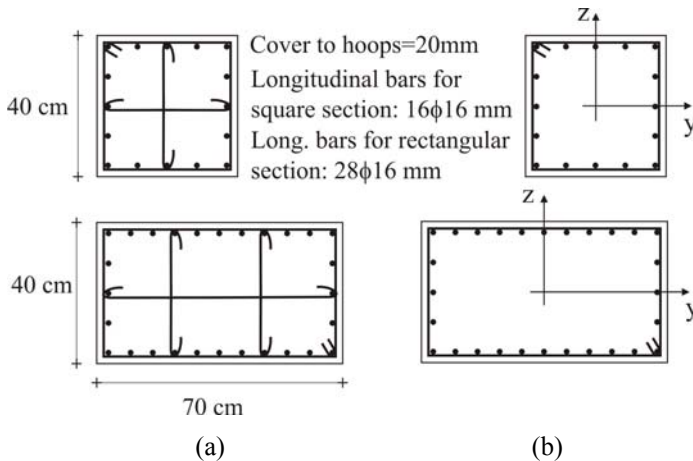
Details of longitudinal and transverse reinforcements of a column: (a) critical end zones; (b) central zone
